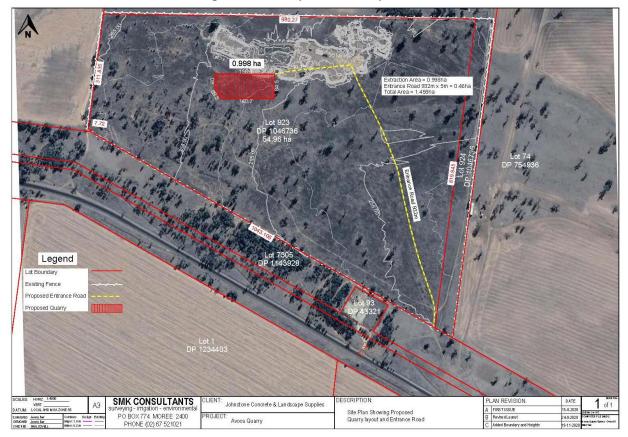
Site Plan showing Proposed Avoca Pit Extraction and Total Footprint
